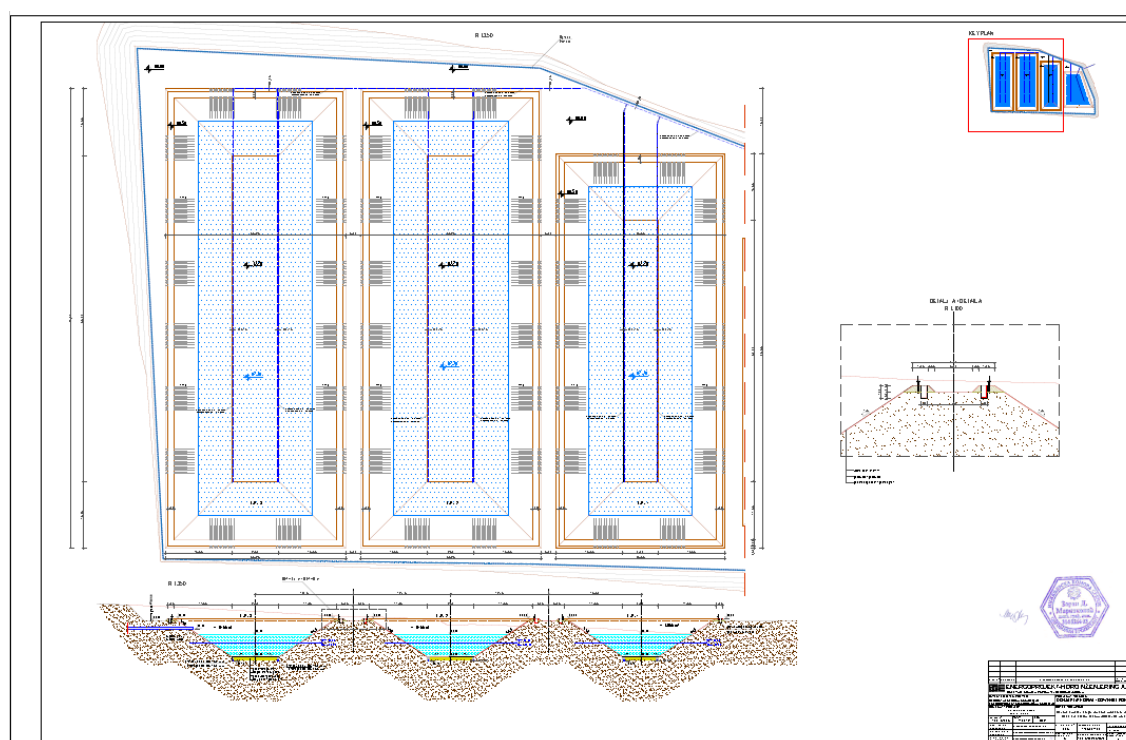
Cross-section of the leachate water pond on the Lower platform (Source: IDP Book 3/6 Hydrotechnical installations design, Energoprojekt Hidroinženjering, May, 2019)
